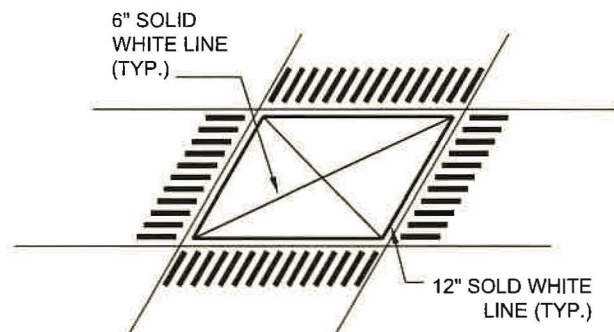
DETAIL D: CROSSWALK STRIPE SPACING AND LENGTH
